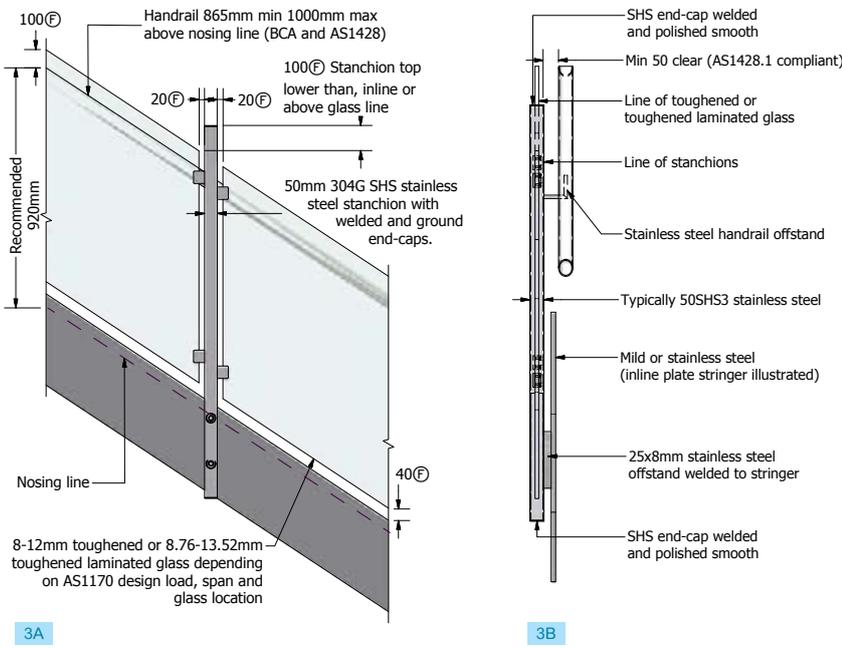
Staircase stringer fixing method utilising 25x8mm stainless steel offstand bar (welded to stringer), suitable for most metal stringer types.
